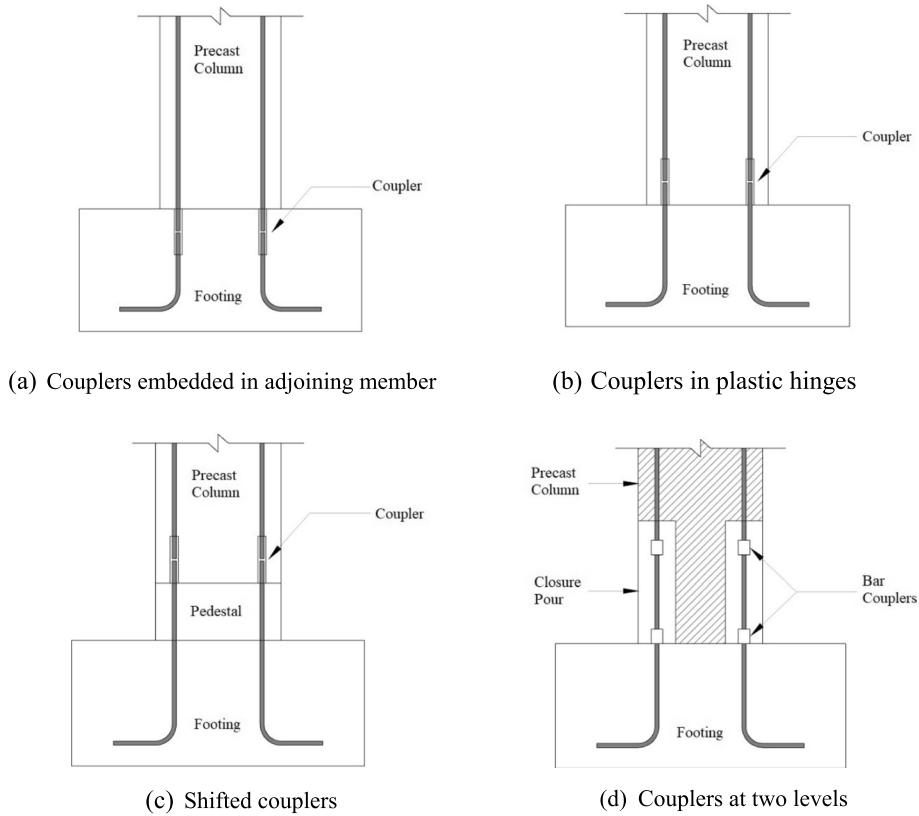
Some details for using couplers in a connection (Saiidi et al. 2020)
